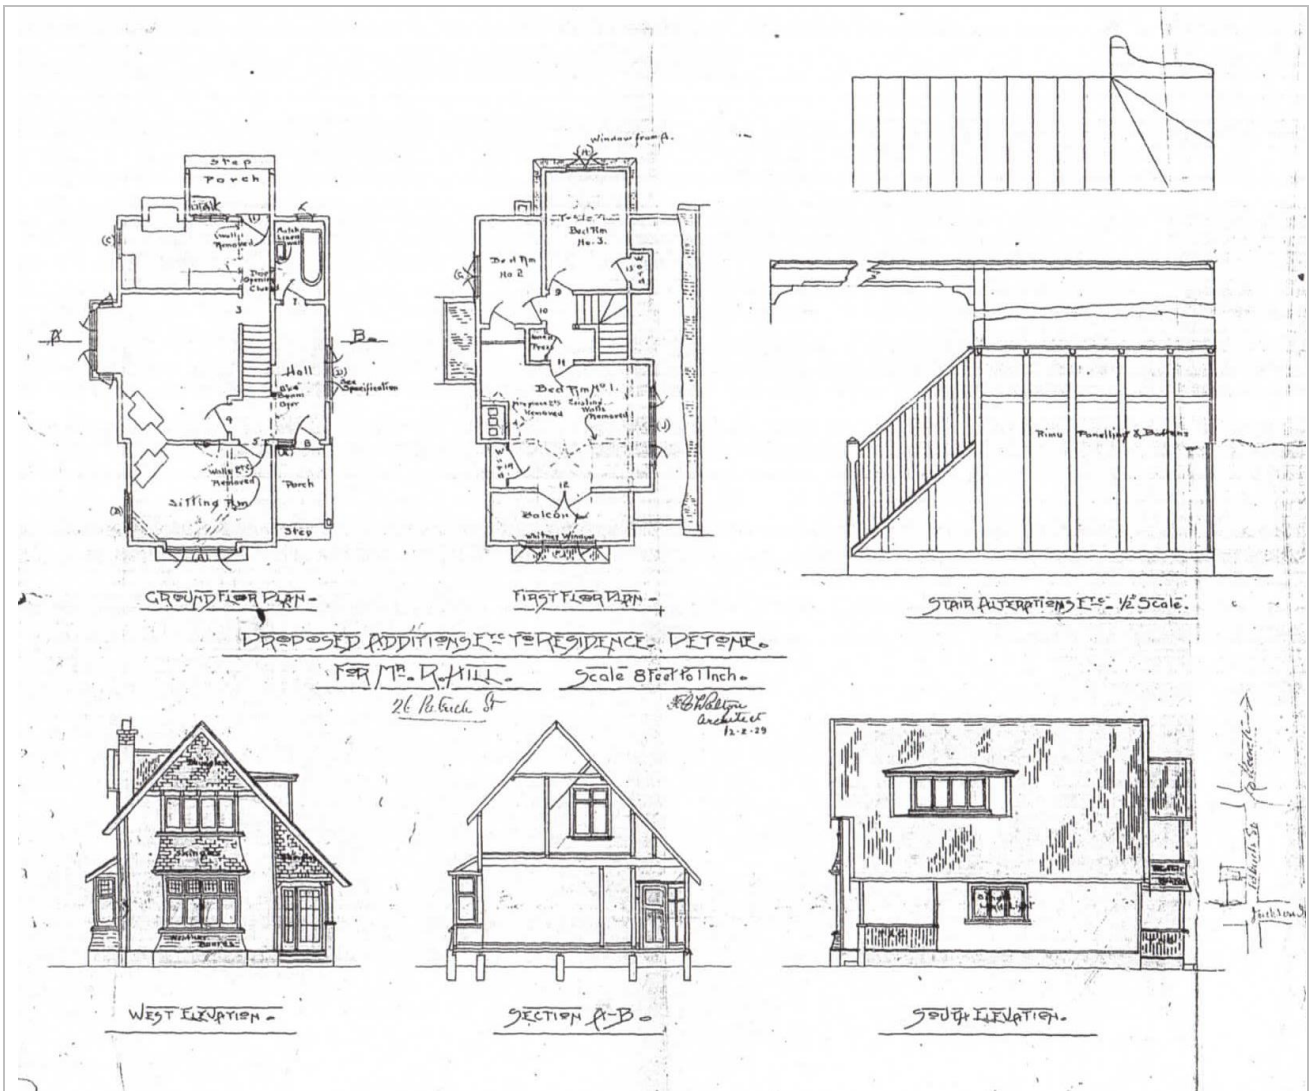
Plans and elevations showing alterations and additions to 26 Patrick Street in the 'Arts & Crafts' style completed by F. G. Walton in 1929. Source: Owner Supplied
